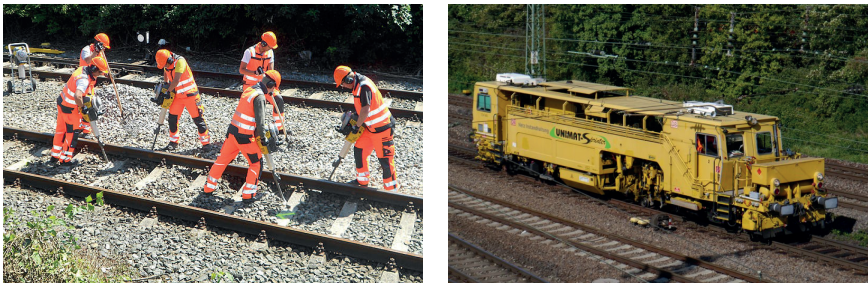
Spot tamping with hand-held devices (left [47]) and the tamping machine UNIMAT Sprinter (right [48]).
